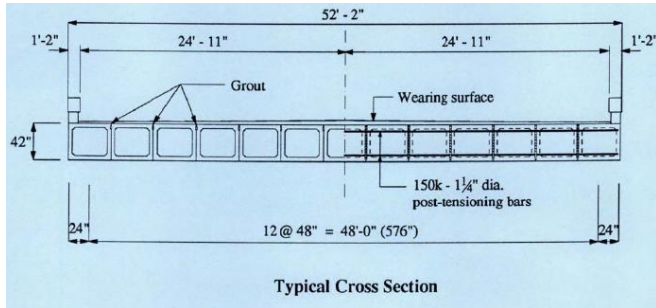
Typical style of adjacent box girder bridge in America (El-Remaily et al., 1996)
